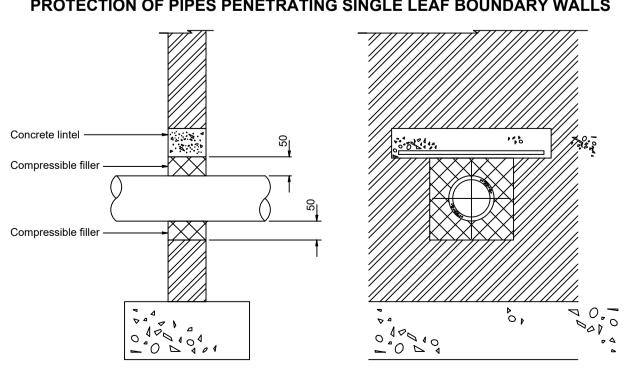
PROTECTION OF PIPES PENETRATING SINGLE LEAF BOUNDARY WALLS
